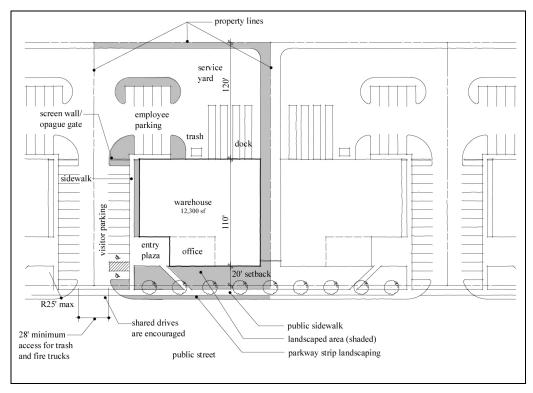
Building Typical Layout Traffic Circulation and Parking with Setbacks
